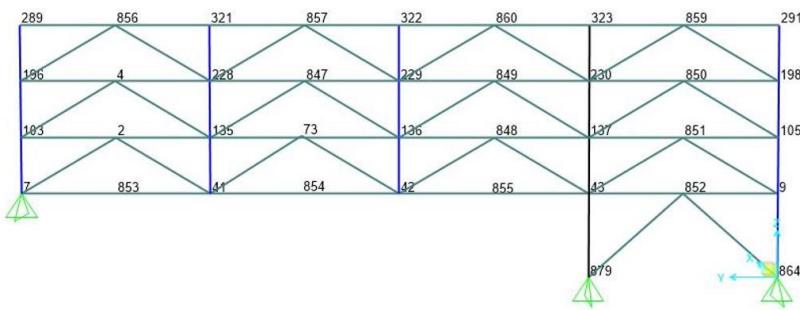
Section Properties - PROPOSAL 2 - West View
